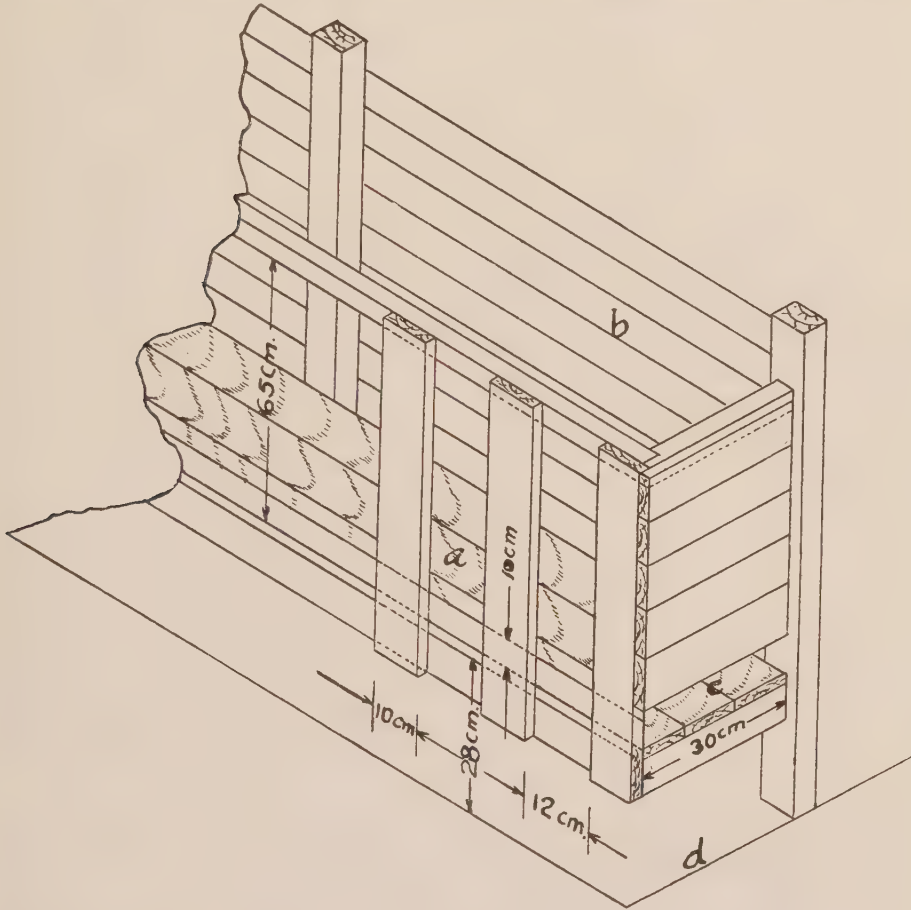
Feeding rack for mature goats; a. head space; b. wall; c. floor of rack; d. ground floor.
